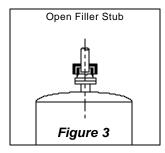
, 4 and 5 VERTICAL PIPE CONNECTIONS:
